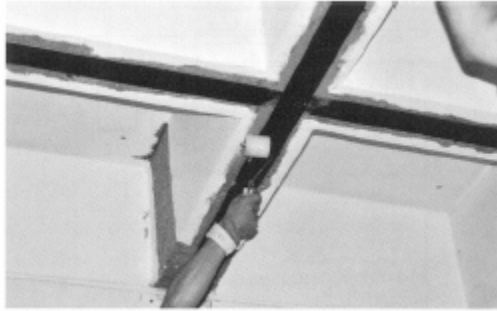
Flexural strengthening of RC beams with CFRP strips
